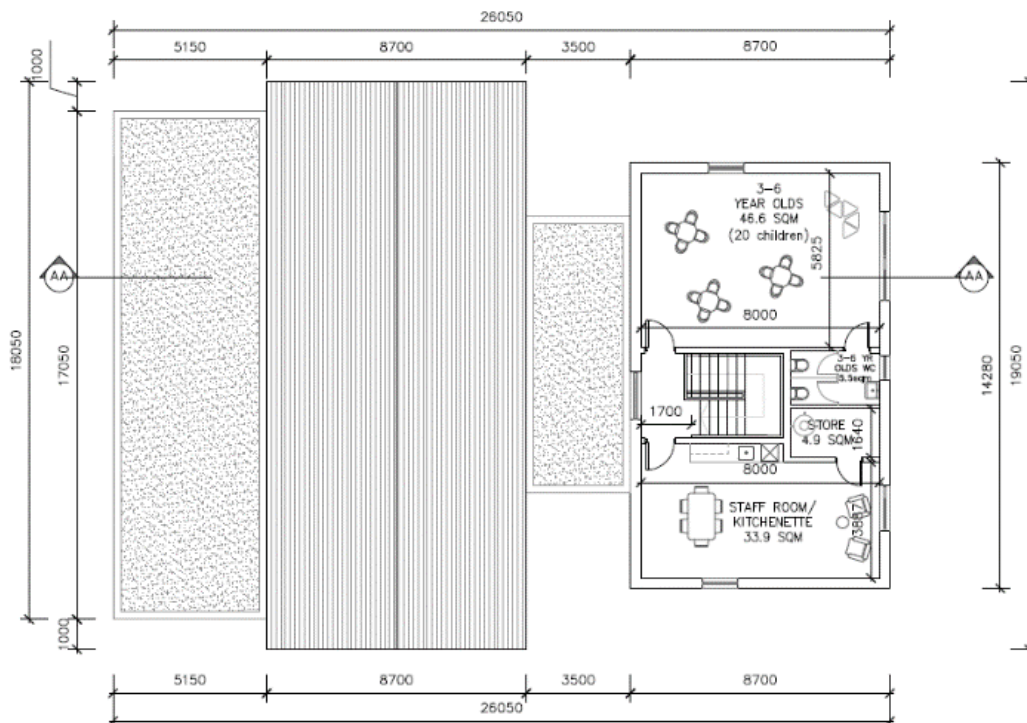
First Floor of Proposed Crèche (Darmody Architects).
